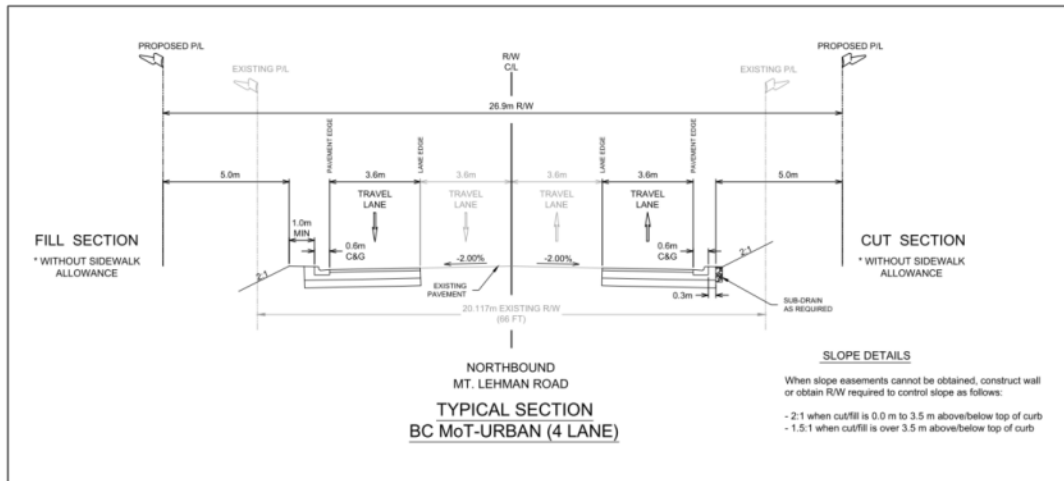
BC MoTI Typical Urban (4-Lane) Cross Section
